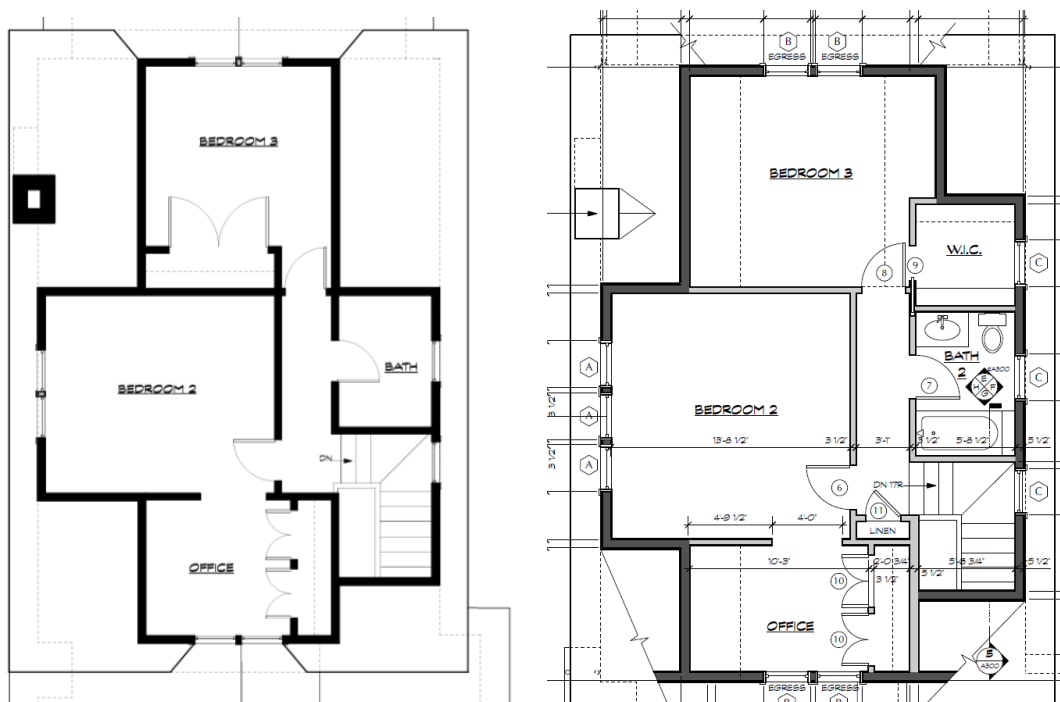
The previously approved second-story floorplan (left) and the revised floorplan (right).
